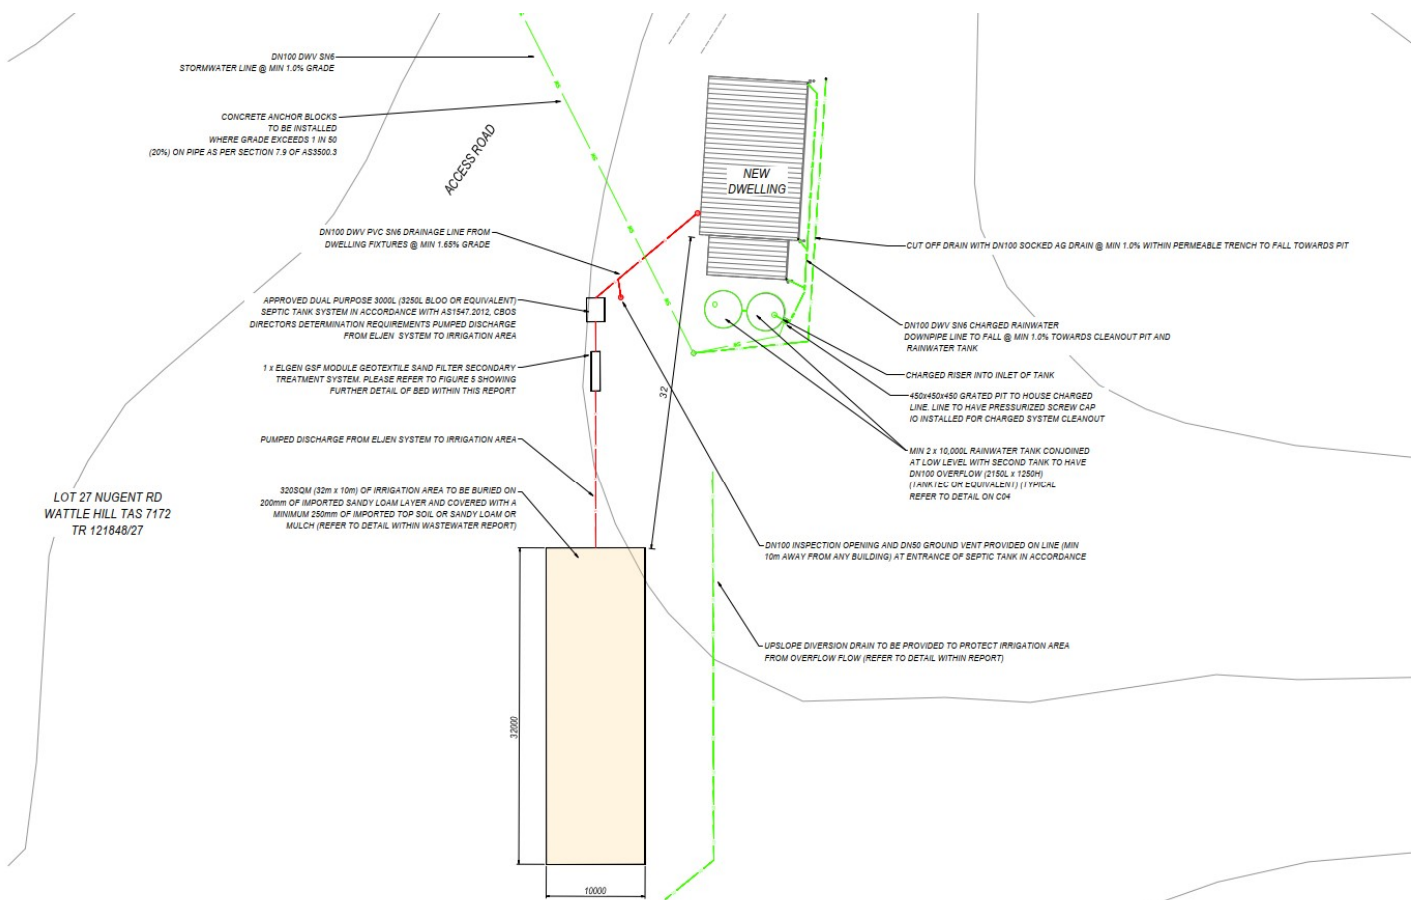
PROPOSED WASTEWATER SITE LAYOUT (DETAILED)
